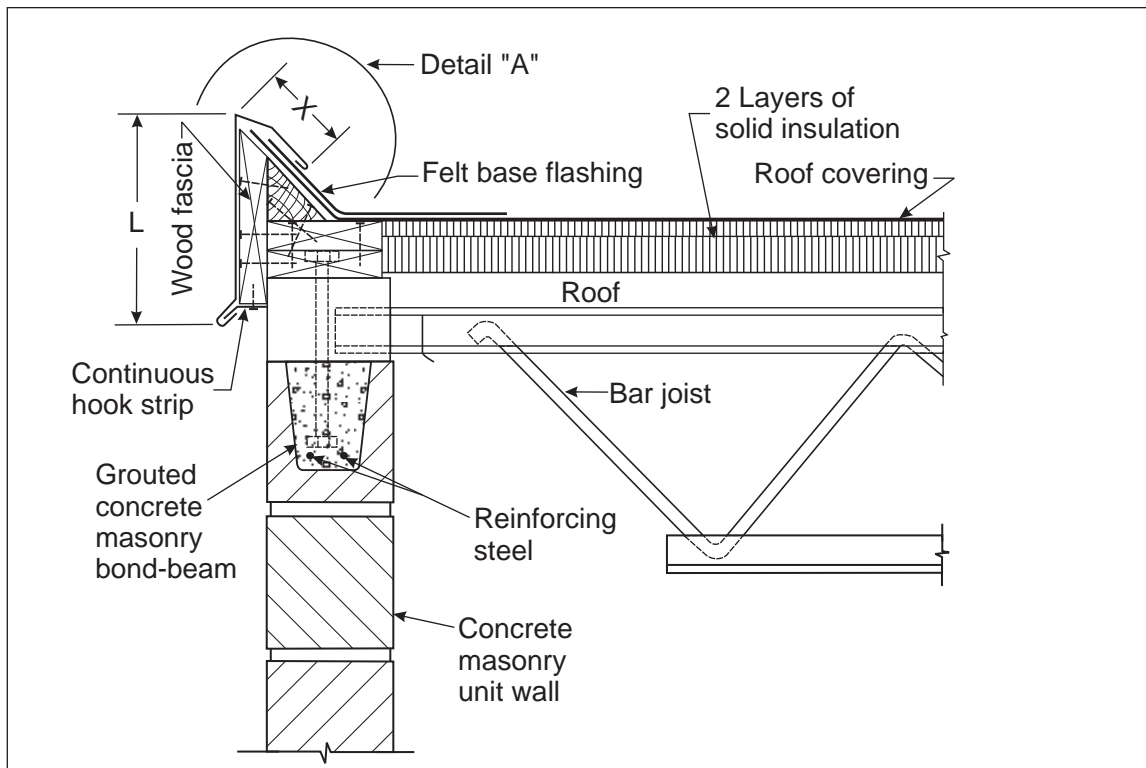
Multi-ply roof cover with roof edge cant and wood fascia
